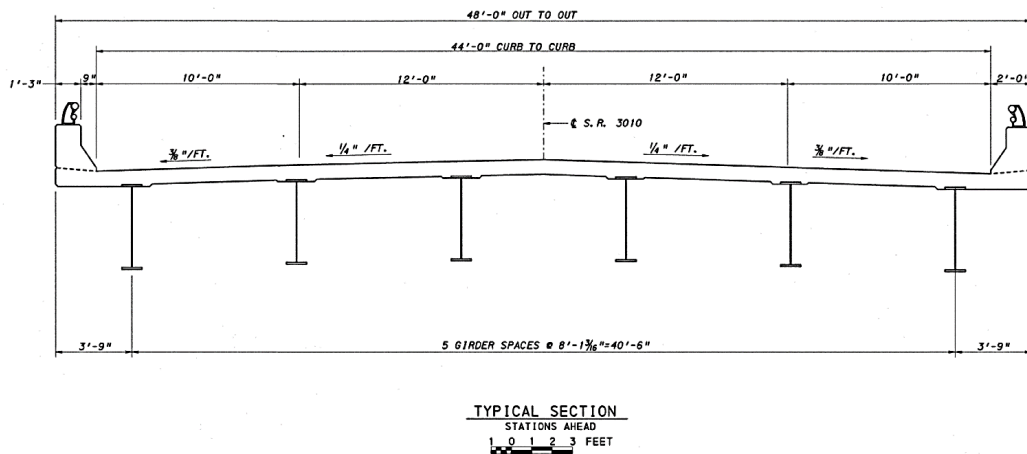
As-Built Plan (Typical Cross Section View) Bridge No. 22451
